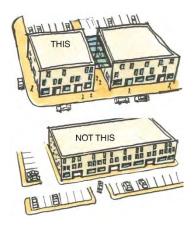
Off-street parking uses should not be located between the front of a building and the public sidewalk.
